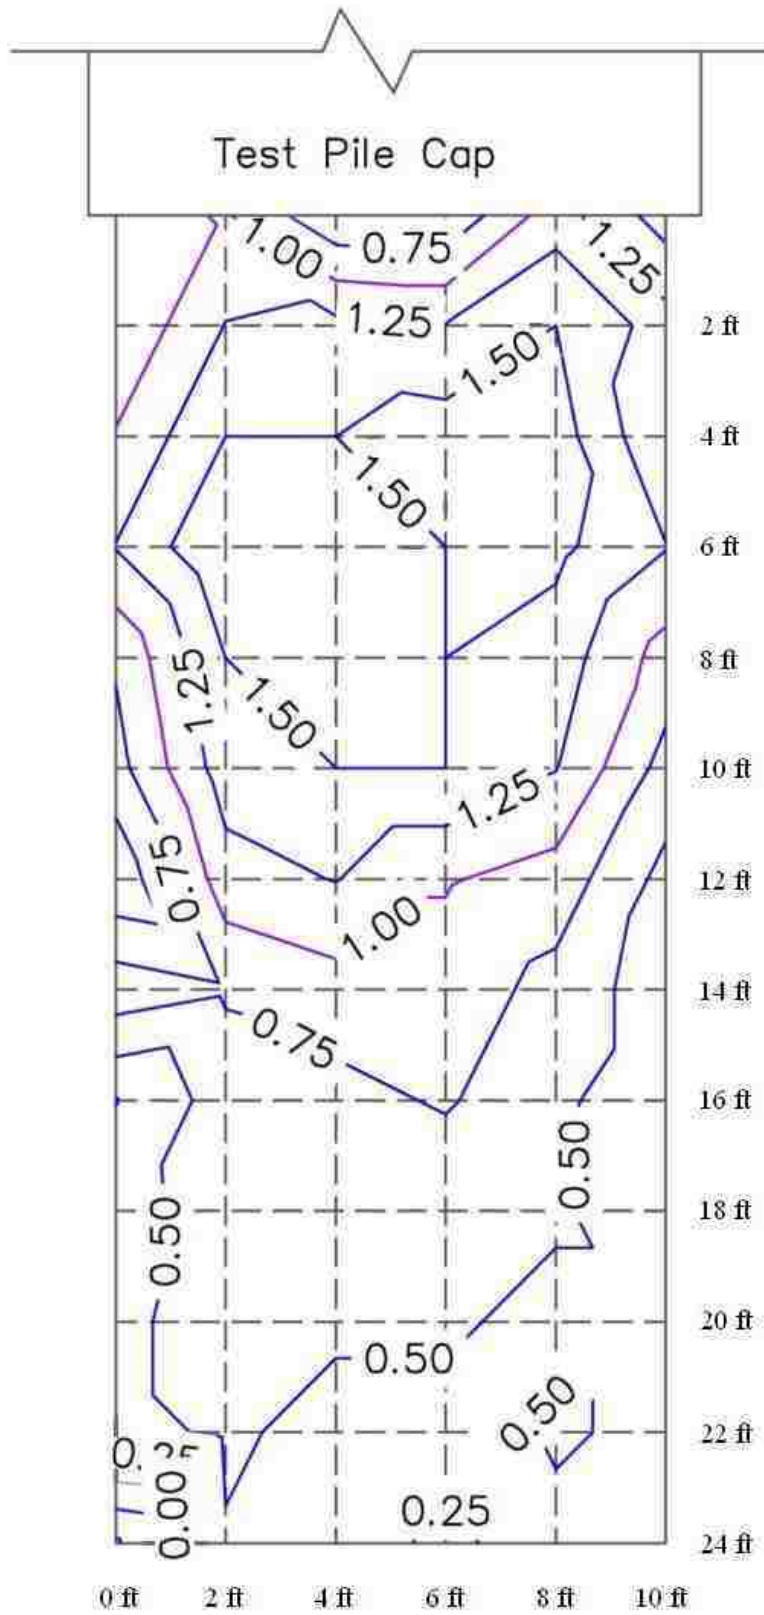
Soil heave profile, MSE wingwall test 2 (repeat of Figure 8-15).
